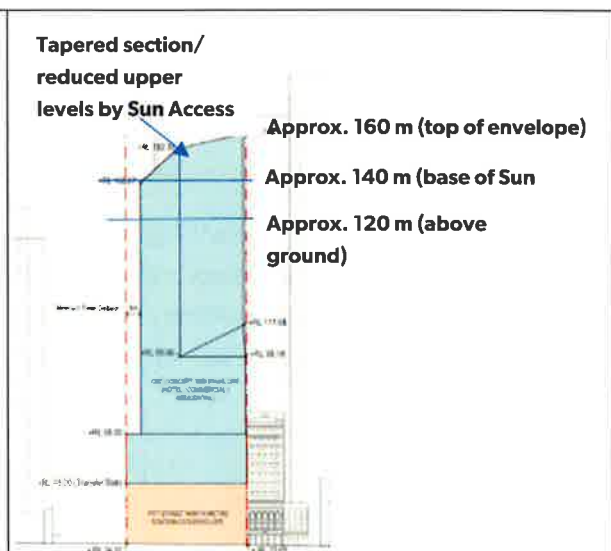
| Building Envelope- East Elevation (Source: EIS with added annotation - Not to Scale).
